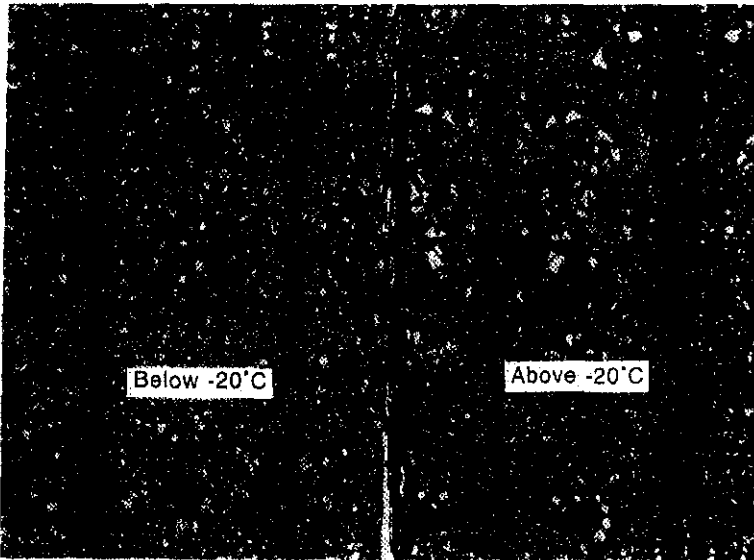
Photograph Illustrating Fracture Faces of Asphalt Concrete Beams Tested Above and Below -20°C
